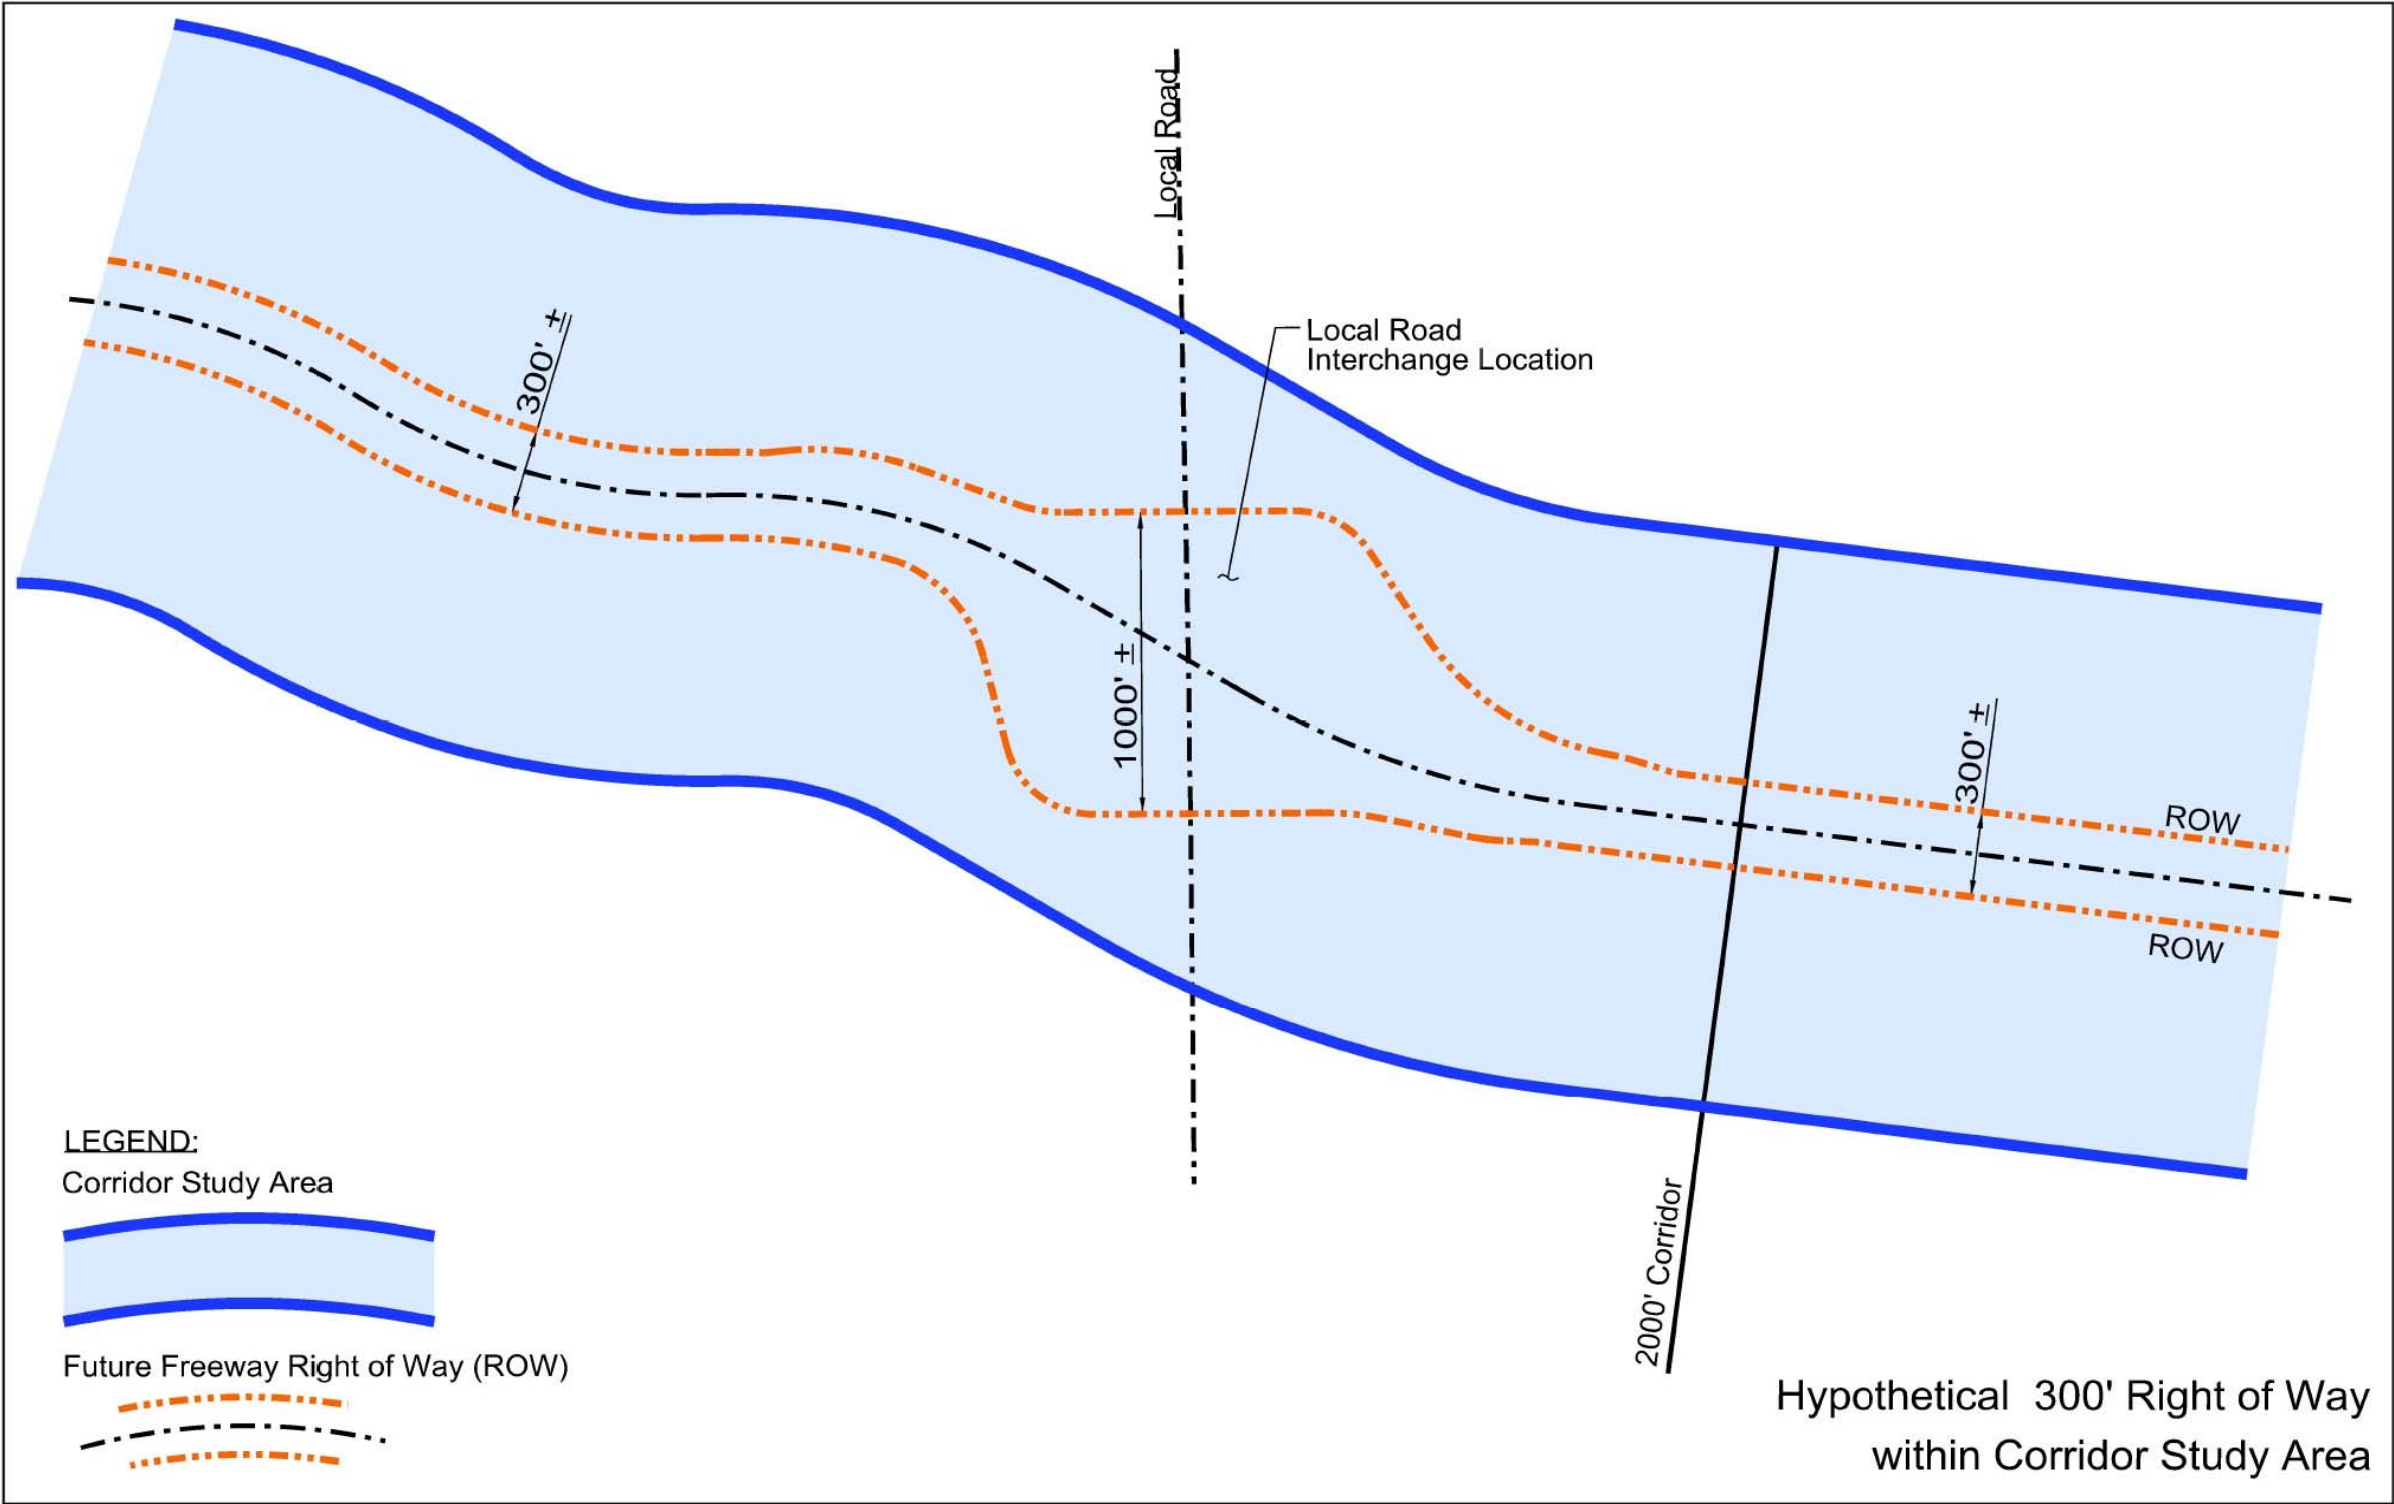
Potential Layout of the Furture Roadway under the Action Alternatives
